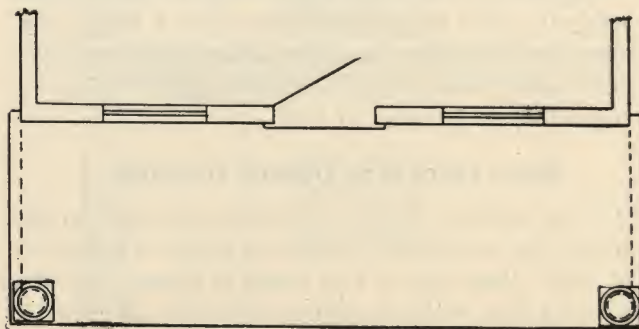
Facia of house and porch in line; porch foundation projecting.
